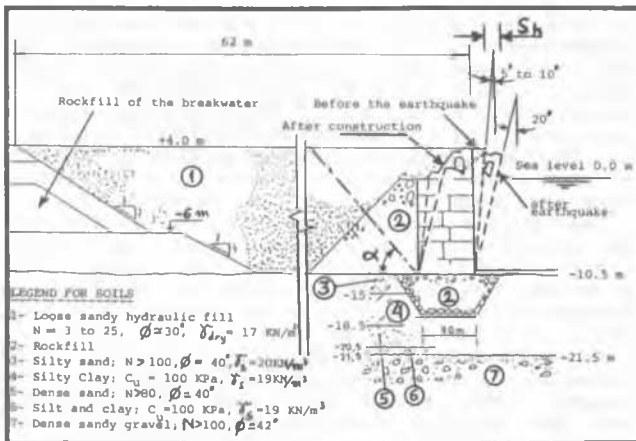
TYPICAL CROSS SECTION OF SITE 1.
